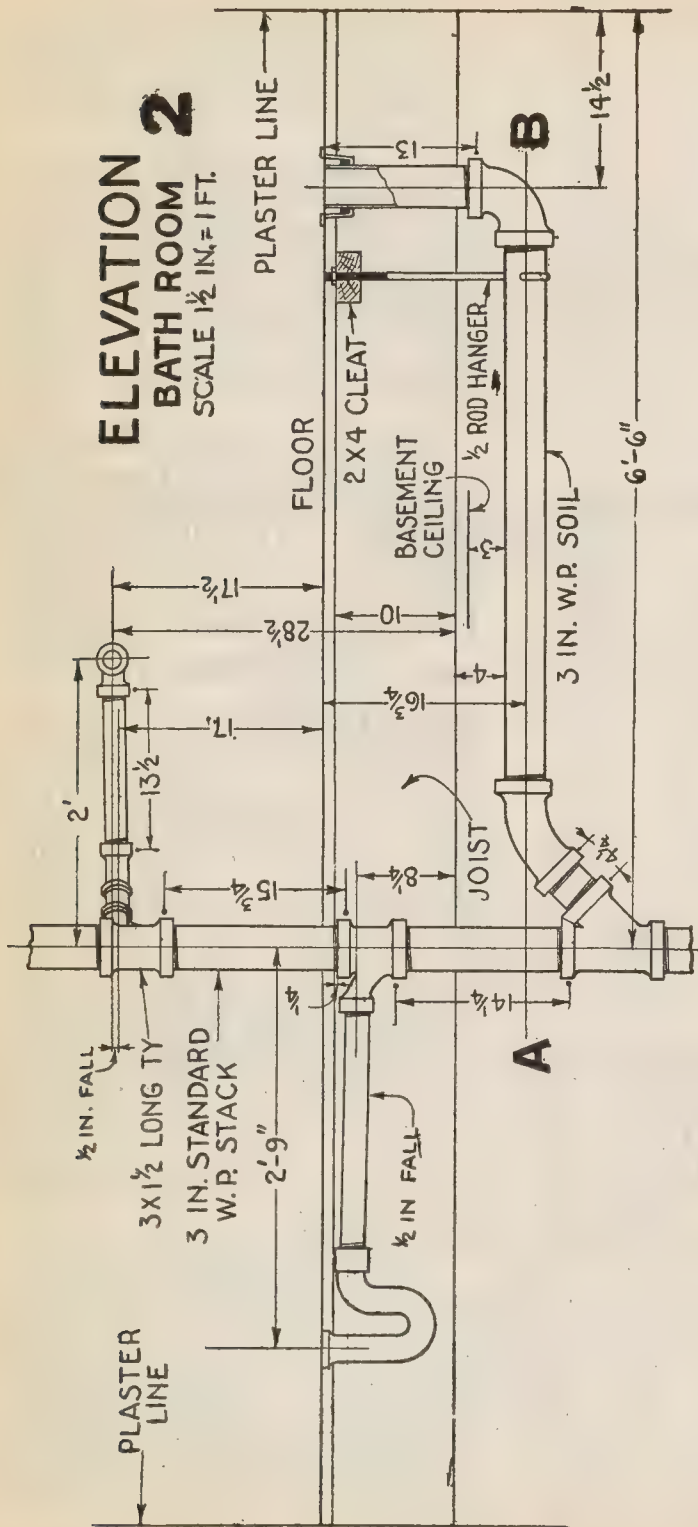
Elevation of roughing in for bath room showing dimensions with wrought pipe and recessed screwed fittings.
